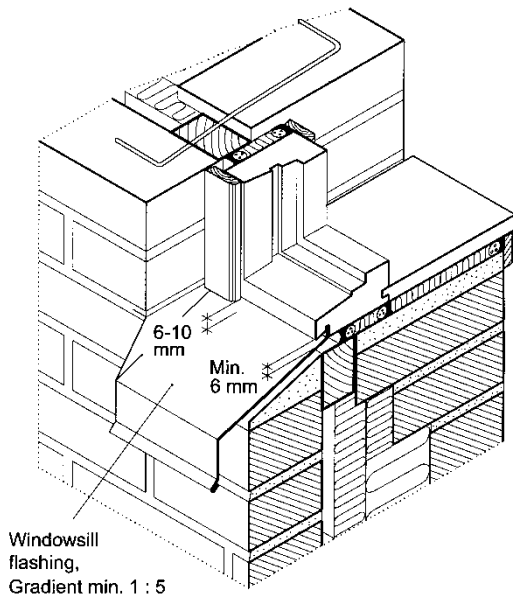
Recommended design of a window installation in the outer side of a cavity wall
